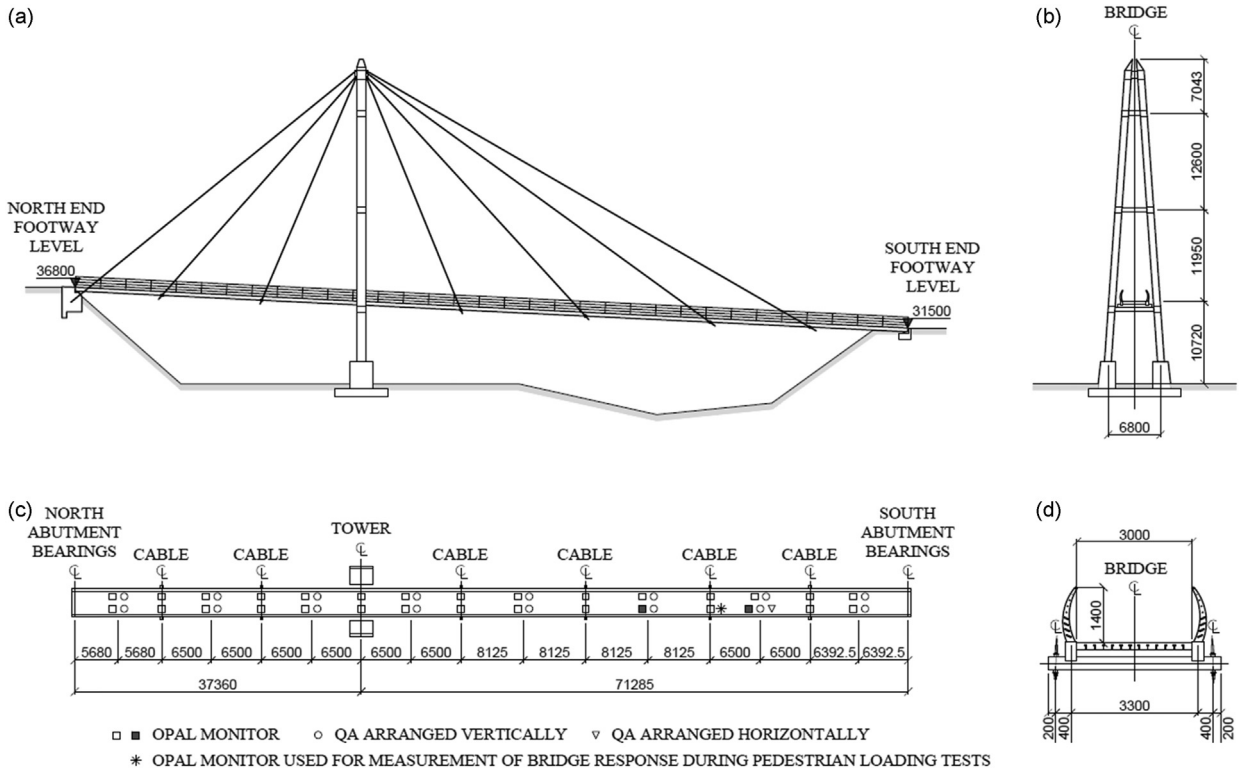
(a) Elevation and (b) cross-section through the tower of Baker Bridge. (c) The true plan on deck together with instrumentation layout. The roving and reference OpalTM monitors are denoted by empty and filled squares, respectively. (d) A cross-section through the deck.
